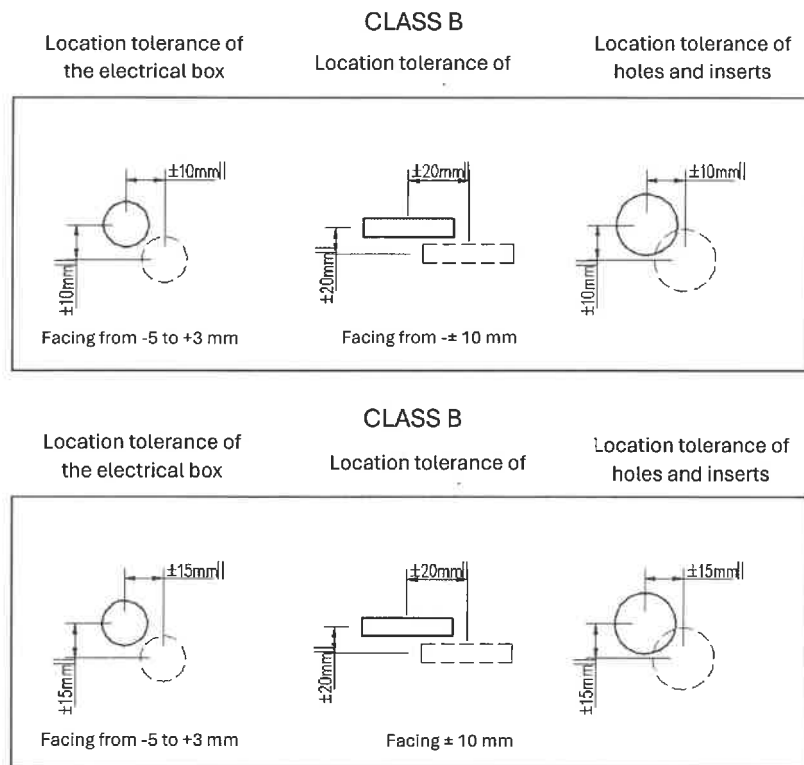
Embedding tolerances for electrical outlets, accessories, holes and inserts.
